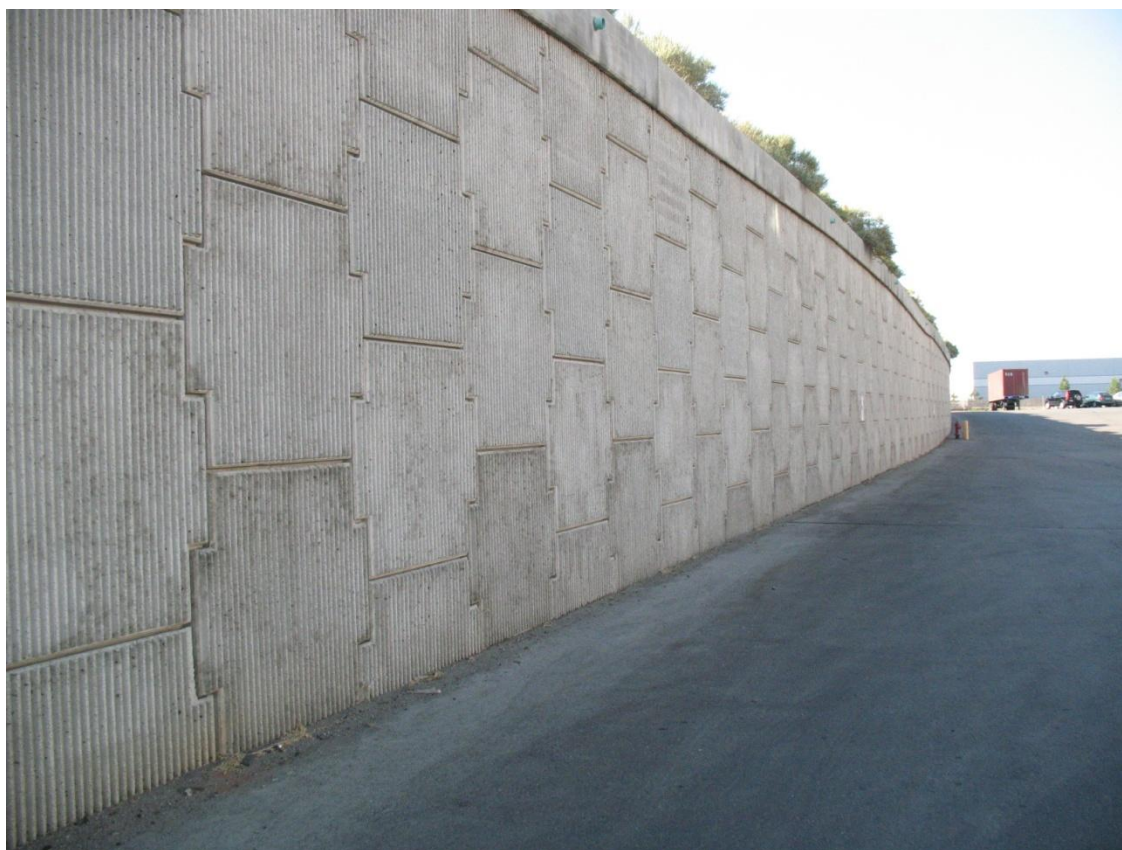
MSE Wall Located at South McCarran and I-80 (Contract #2957)
